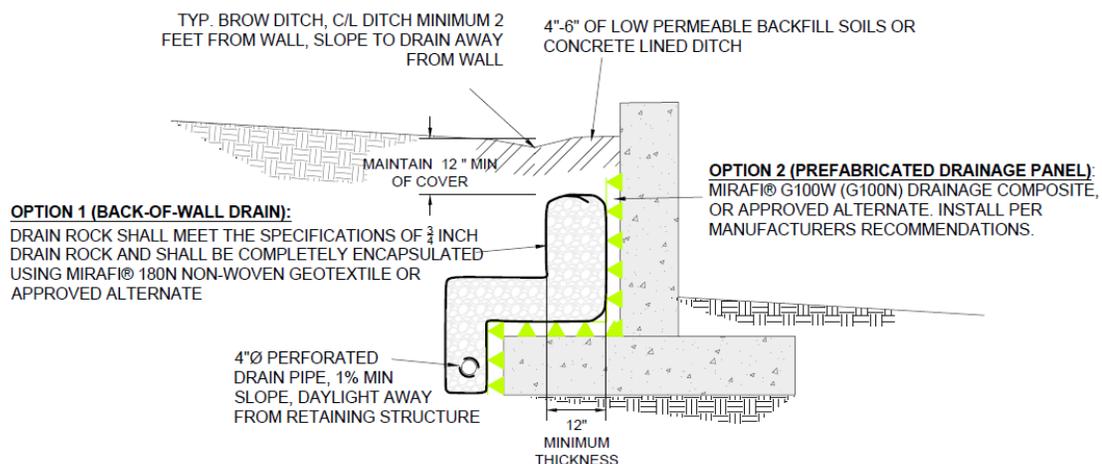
Option 1 Typical Basement Retaining Wall Back-of-Wall Drainage Schematic
